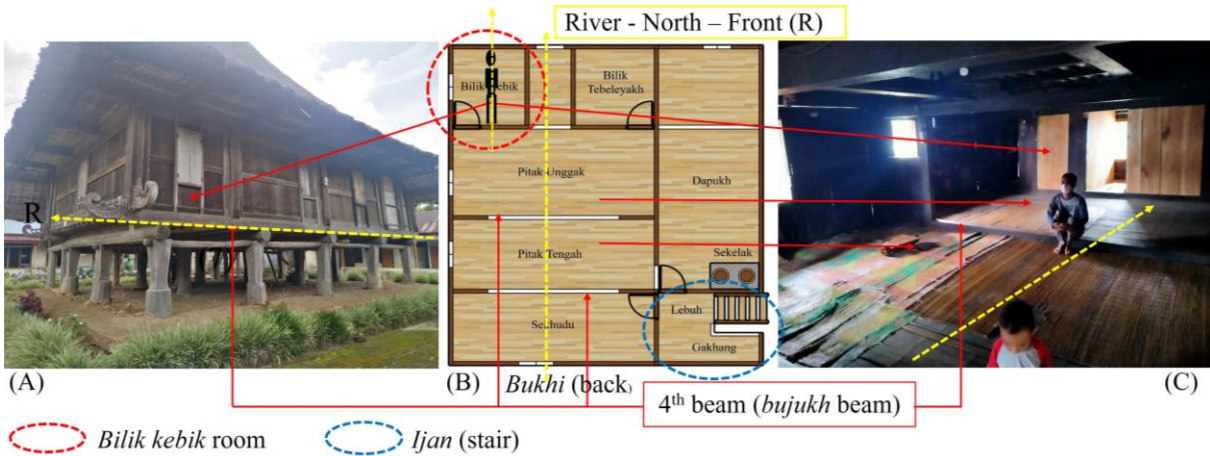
Exterior (A), floor plan (B) and interior (C) views of the house body (*Khesi*) as an expression of the boat hull
